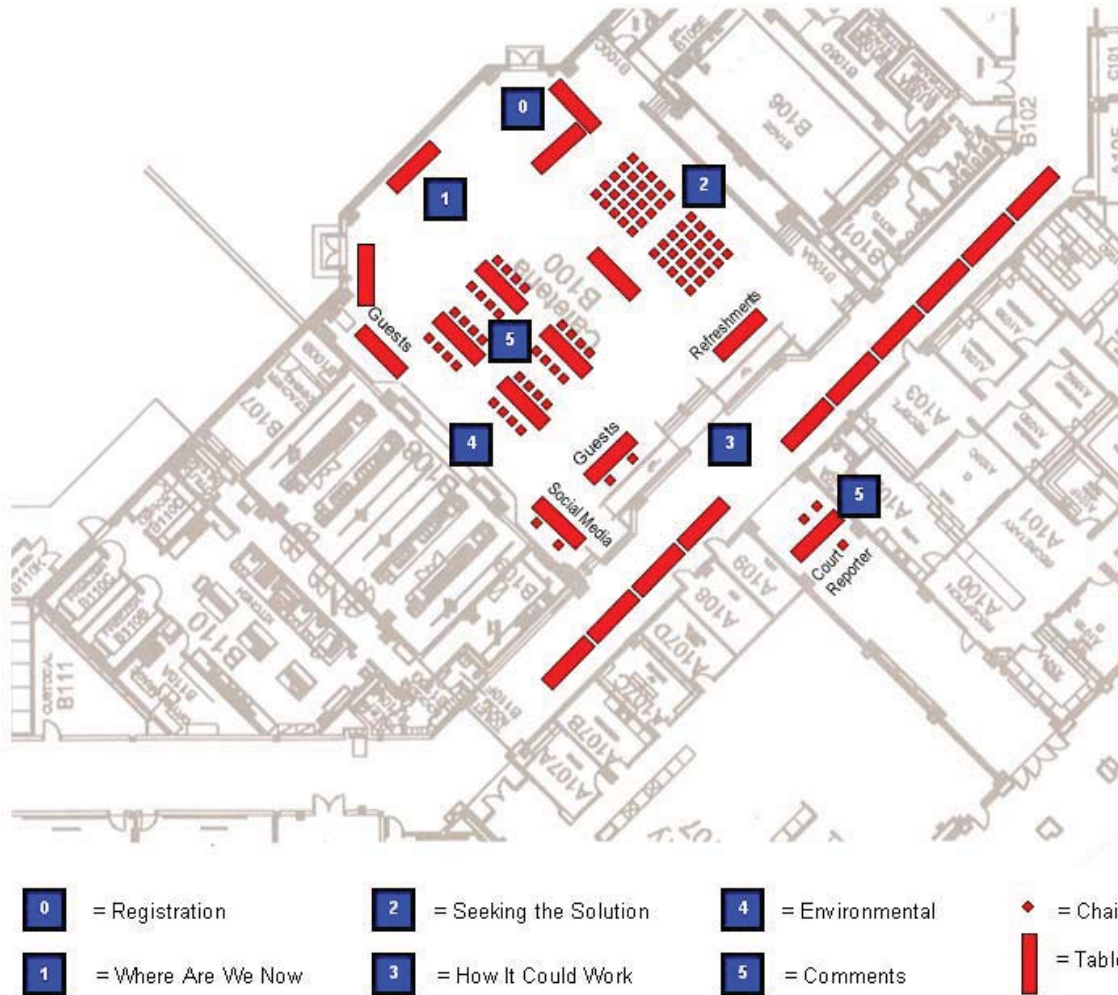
Meeting Location Layout – Vale Middle School: Cafeteria – April 14, 2010
